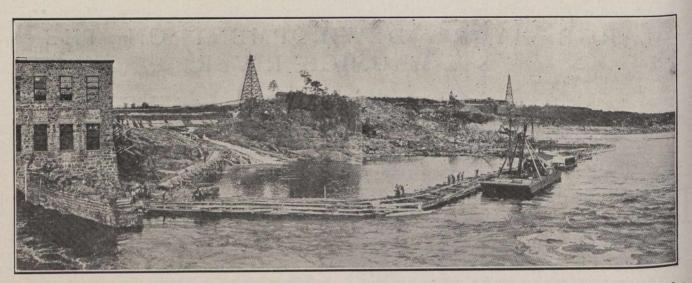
General View, Showing Present Power House and Dam, One of the Cable Towers, Cofferdam Under Construction, Main Island, Crushing and Mixing Plant, and the Main Channel of the St. Maurice.
